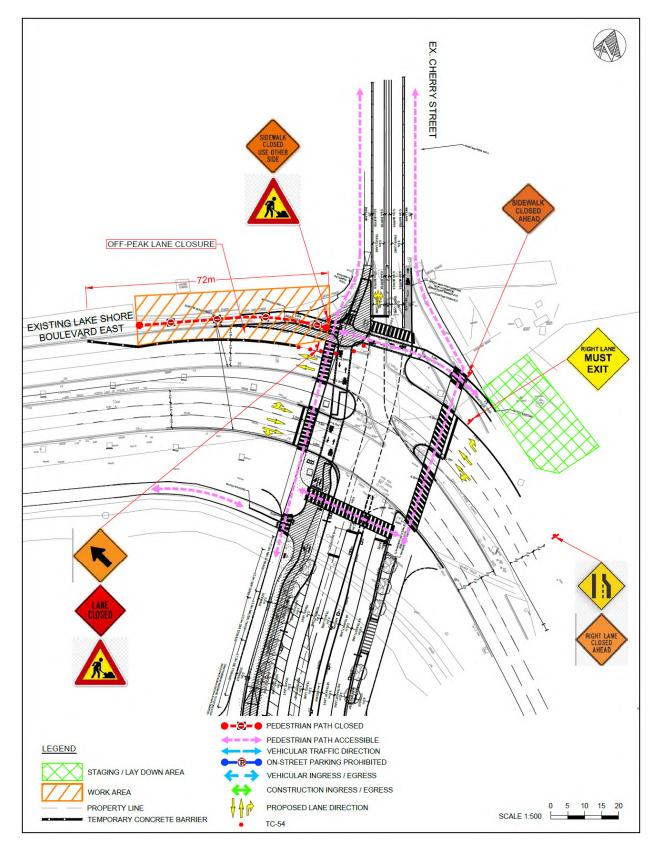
Cherry Street EEB Construction Impacts (Base Plan Source: Waterfront Toronto)
